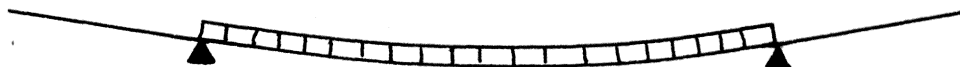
a Cantilever Deflection Due to Center Span Loading
